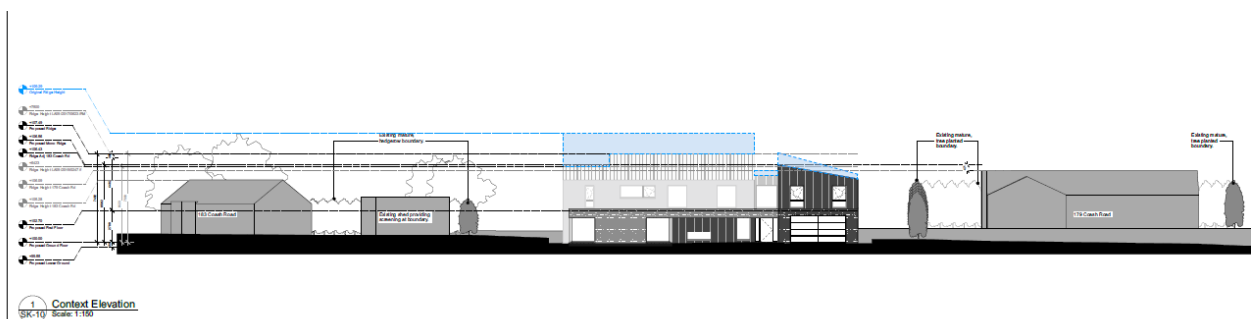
Street scene of proposed dwelling in context of surrounding dwellings
